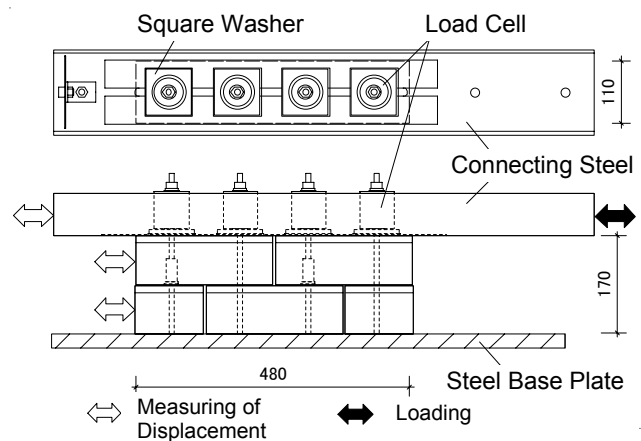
Test piece of BGd, BGe, BCd and BCe type
